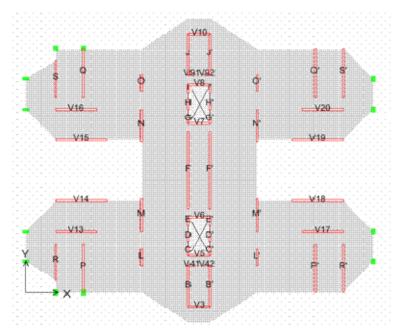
Typical Apartment Floor shear and bearing wall system and model labeling
